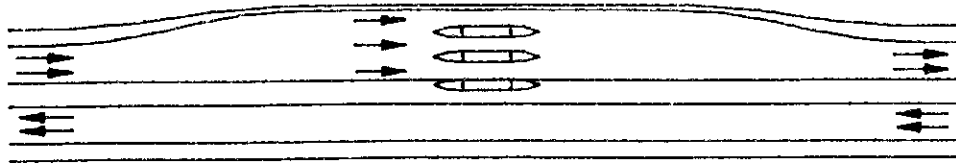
Typical Layout of Toll Barrier on Bypass Throughway
